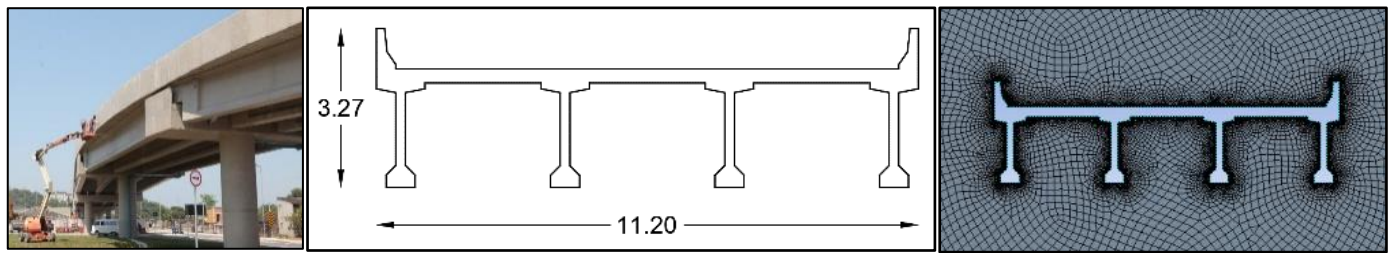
Girder-Slab bridge photo [2], cross section and mesh developed.
